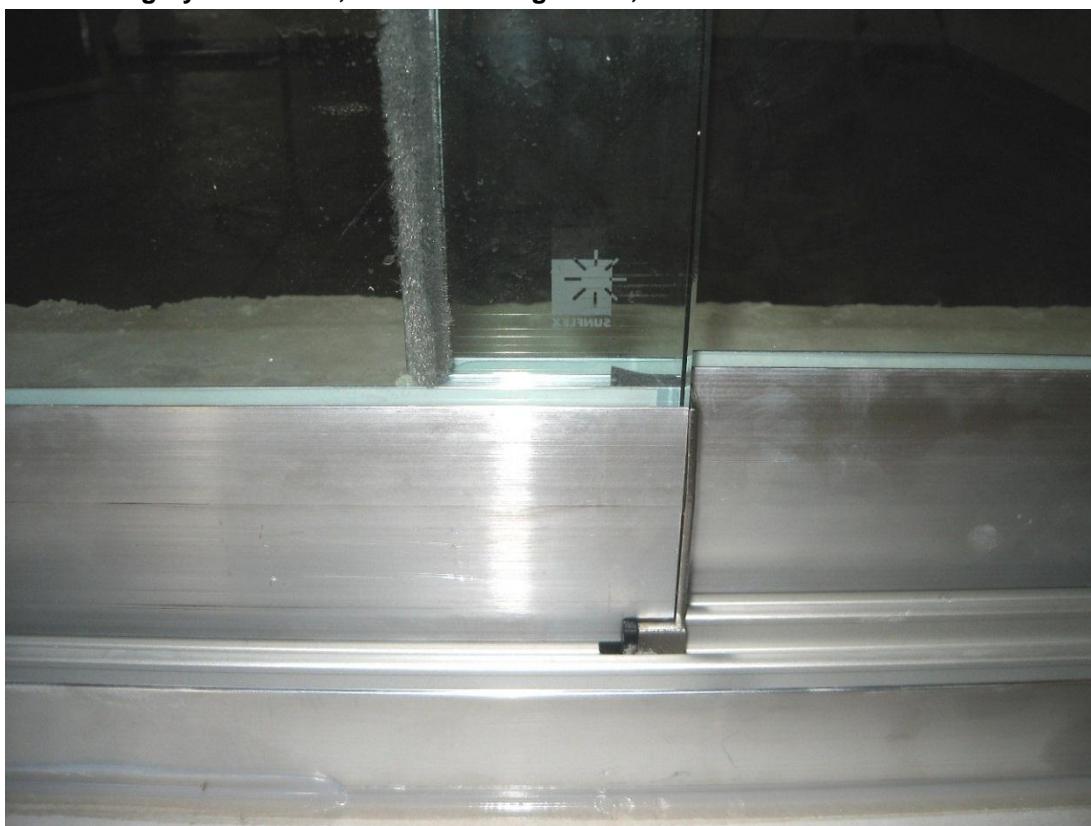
All-Glass Sliding System SF 20, View Receiving Room, Detail connection below
